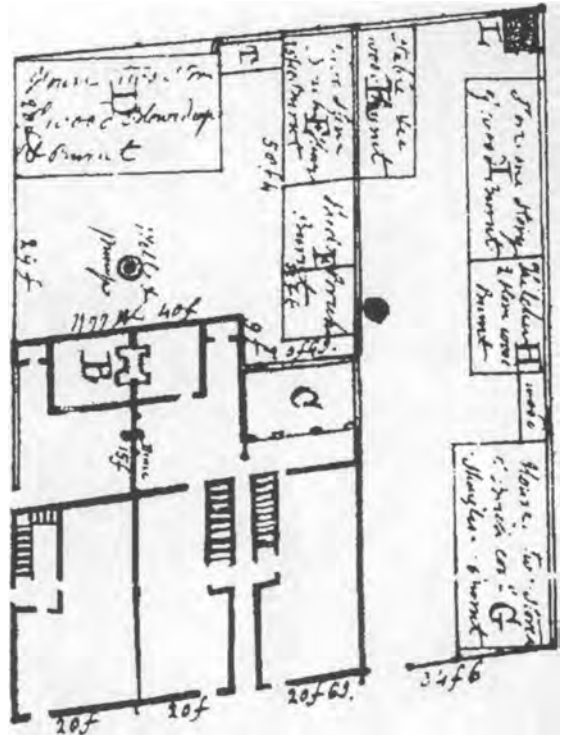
Edmund Petrie house and outbuildings, ca. 1797, Queen Street. (Detail redrawn from McCrady Plat No. 464, Charleston City Archives.)
